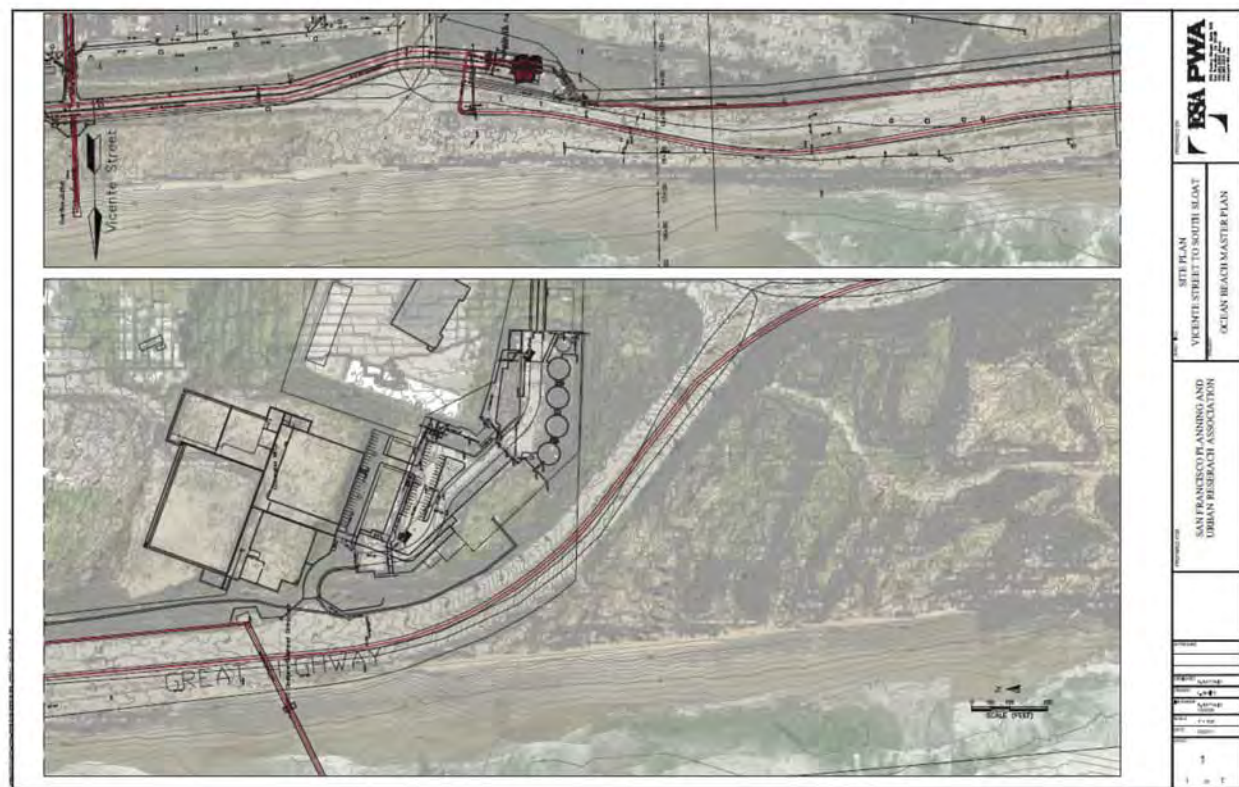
Plan extents of the proposed cobble berm are generally from Sloat Boulevard to the south end of the Southwest Sewer Treatment Plant, in the Master Plan region called South Ocean Beach (SOB).
